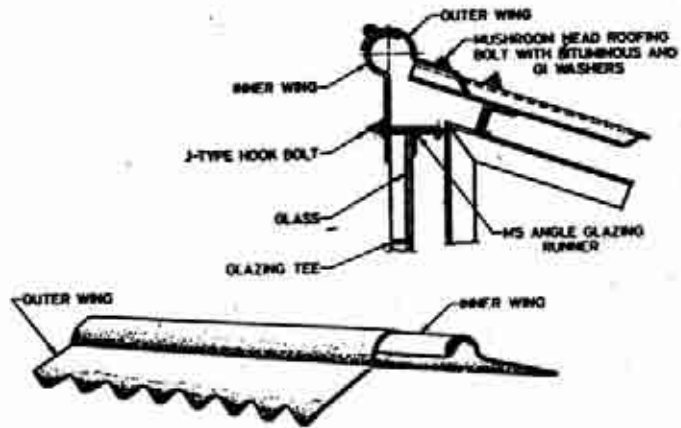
FIG. A TYPICAL NORTHLIGHT TWO-PIECE ADJUSTABLE RIDGE
